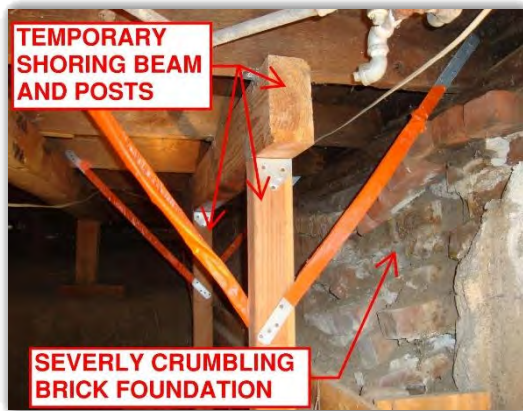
Crumbling Foundation below East Wall (June 20, 2017)
